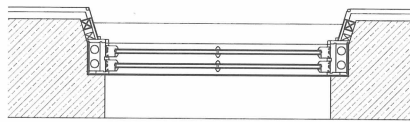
Plan at Jamb with Curved Corner on Completion 1:10
